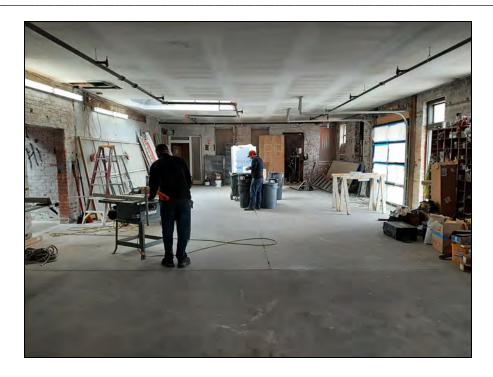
A 2021 photograph of the interior of the warehouse, looking north
